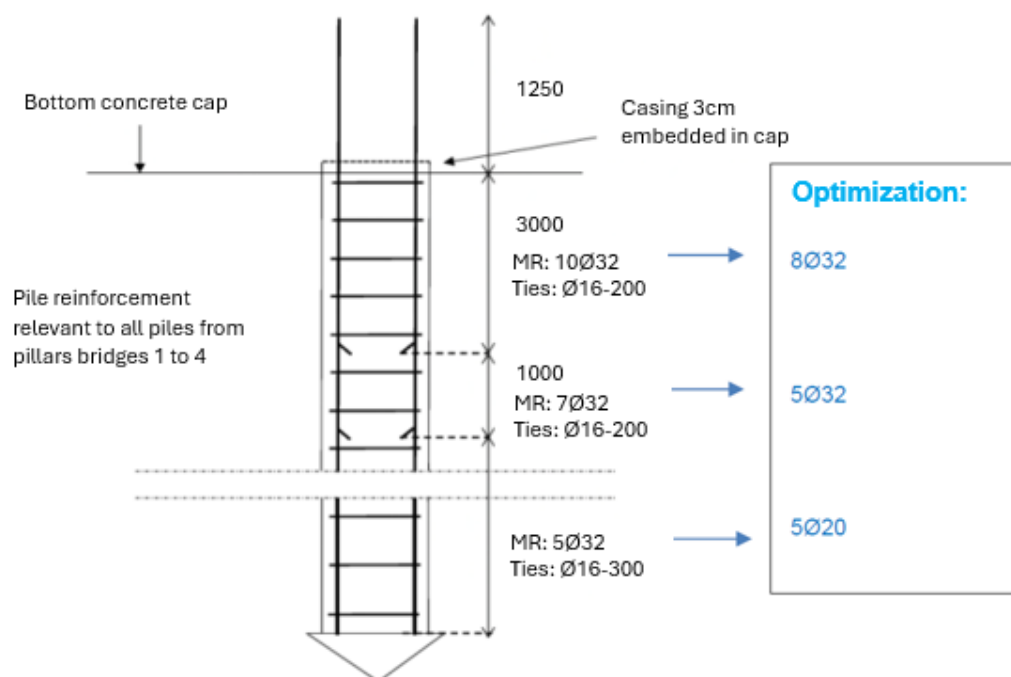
Optimization of pile reinforcement for piles at middle pillars in new situation of the case study project
